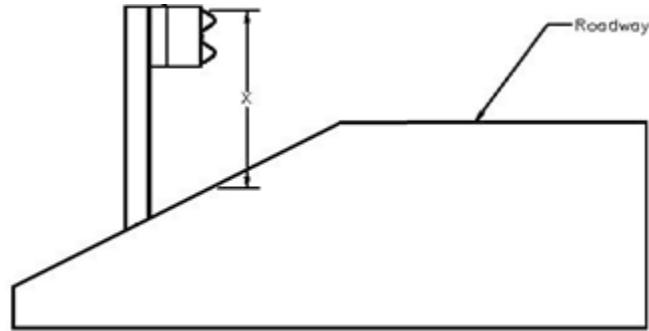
Guardrail Height Measured to the Ground at Rail Face
